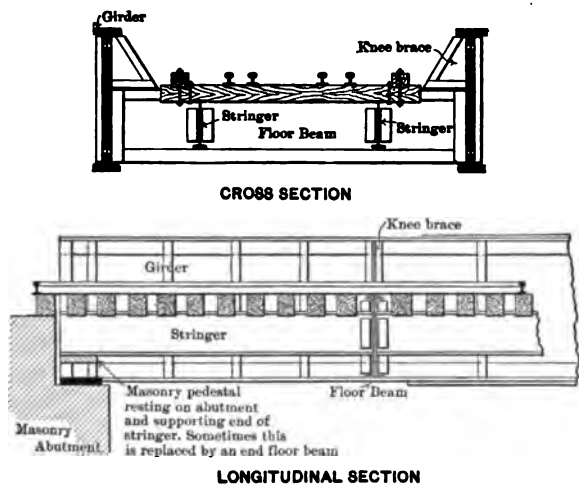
Half-Through Single Track Plate Girder Railroad Bridge.
